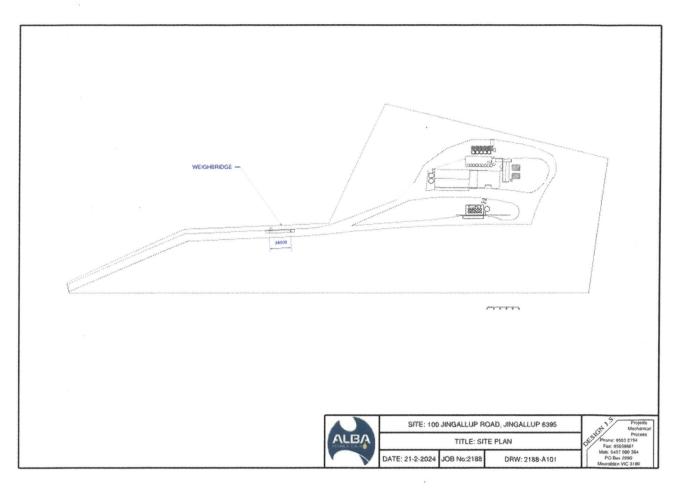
Proposed Site Layout – Farm Management Plan – Aus Oils Kojonup 110 Jingalup Road, Jingalup
